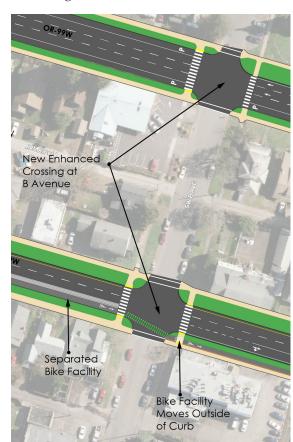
B Avenue Enhanced Crossings at 3rd Street & 4th Street
